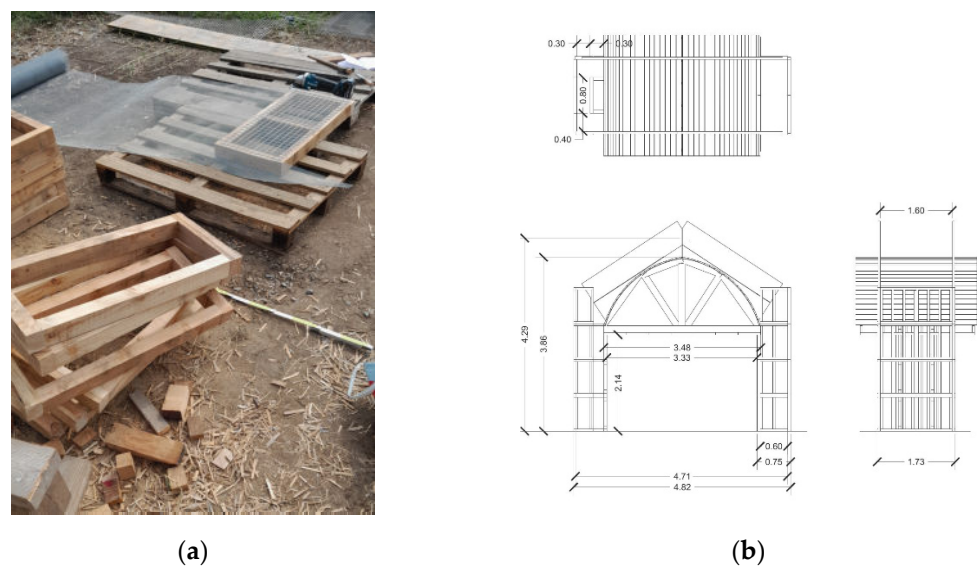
Details of the formwork building process: (a) making the formwork units and (b) design of the entire formwork.
